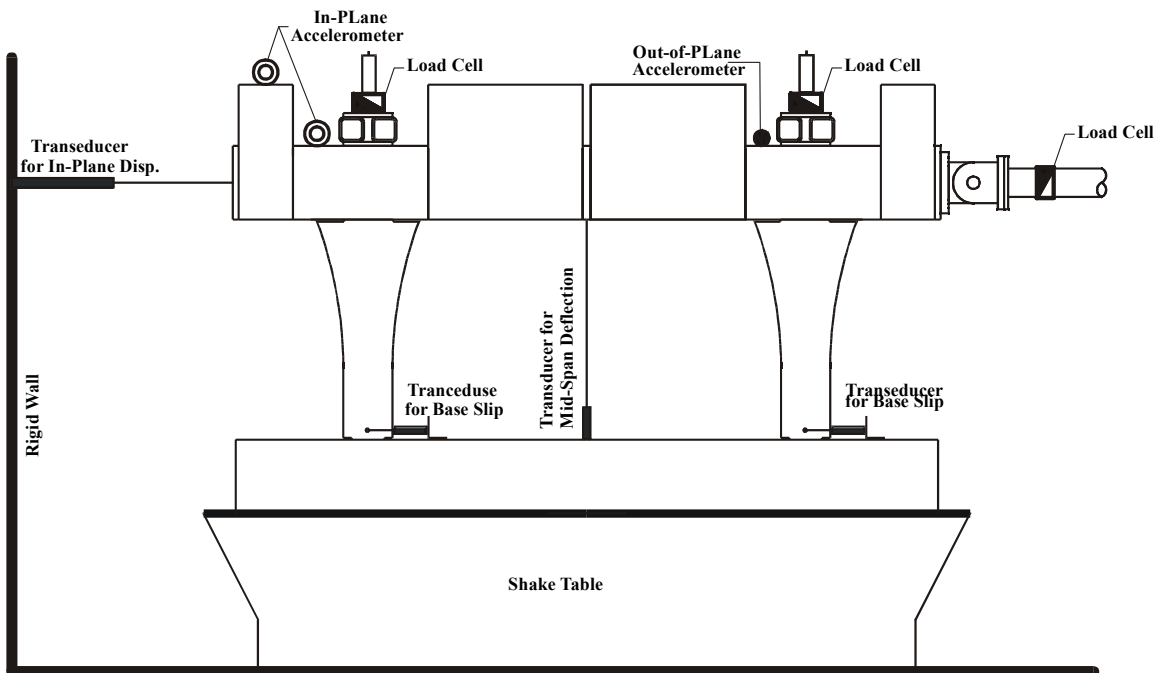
Typical Layout of Displacement Transducers Load Cells and Accelerometer
